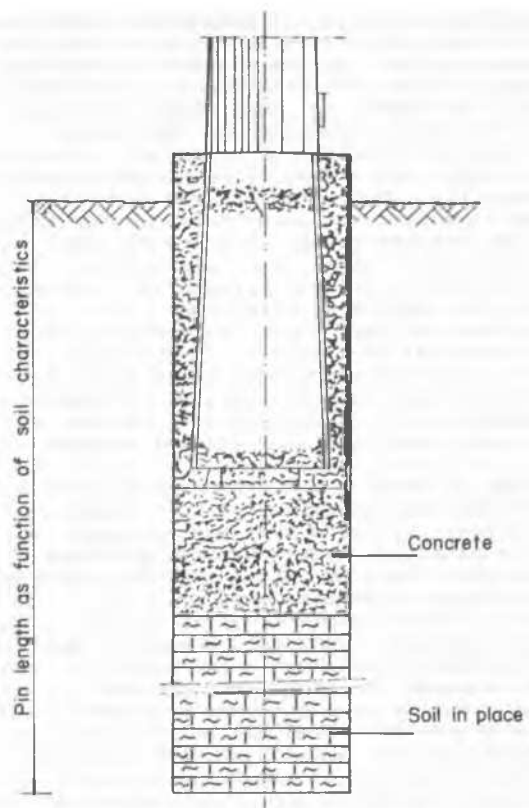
Pole foundation. Driven pier with direct sealing of the support. (Ref. 21)
